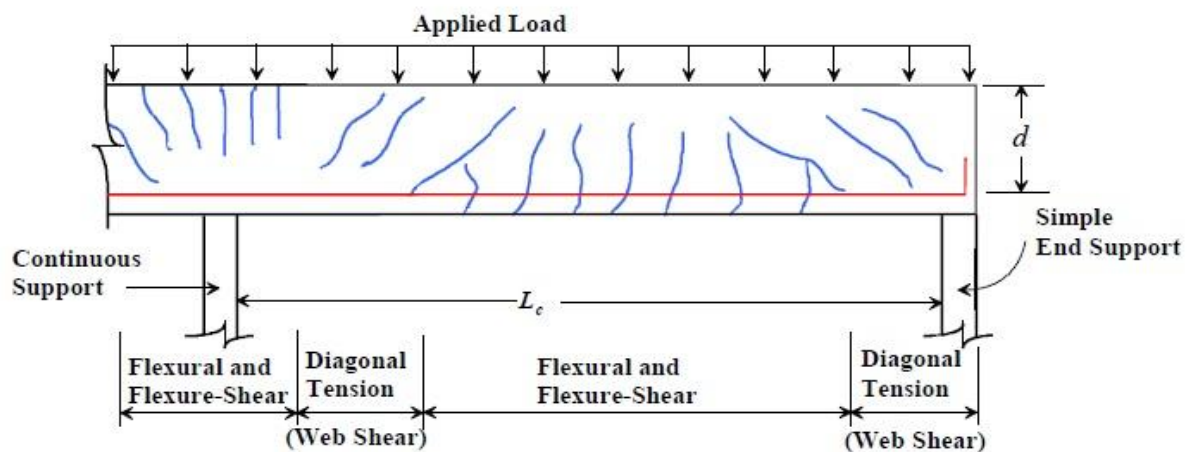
Types of cracks expected in a reinforced concrete beam with or without effective diagonal tension reinforcement.
